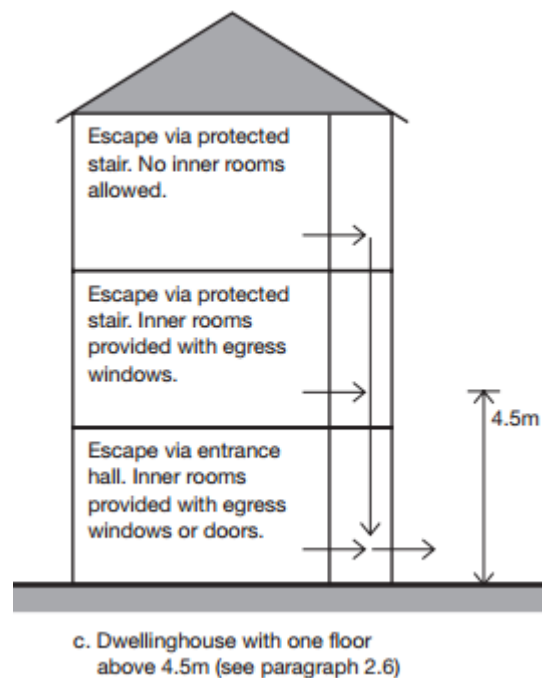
Diagram 1 of ADB Vol 1- Dwelling with a Floor Over 4.5m
